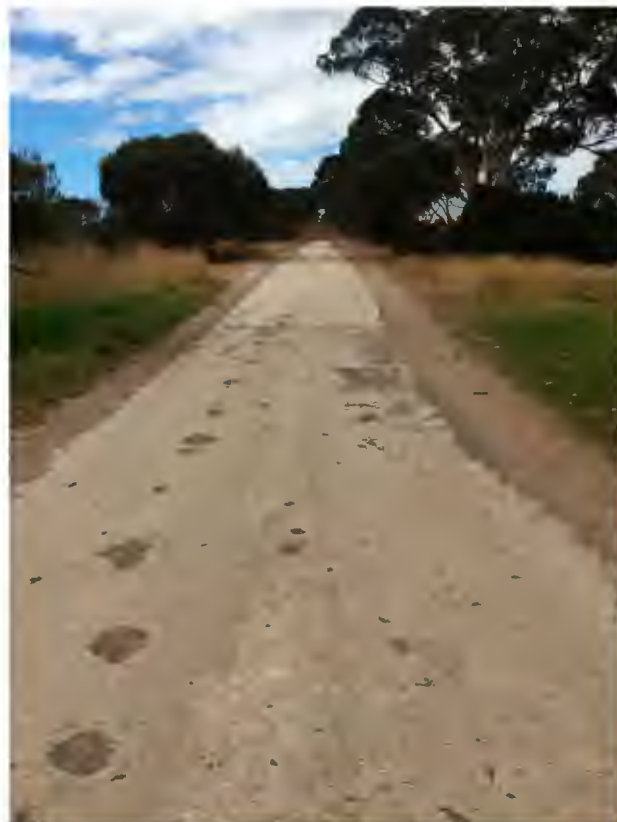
Item 55, insufficient road with on Gap Road.
